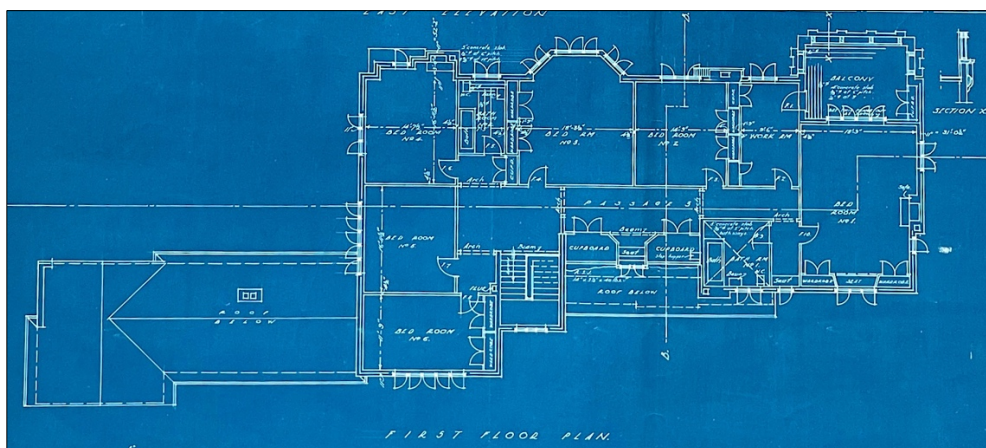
c.1926 first floor plan. Source: Stonington History Centre.
